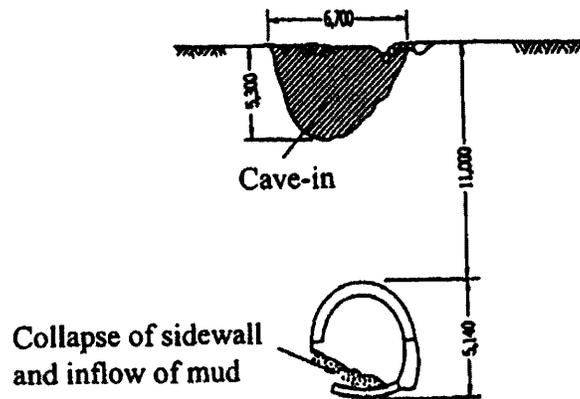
, Cross Section of Iwamoto Tunnel, (Asakura et al. 2001)
